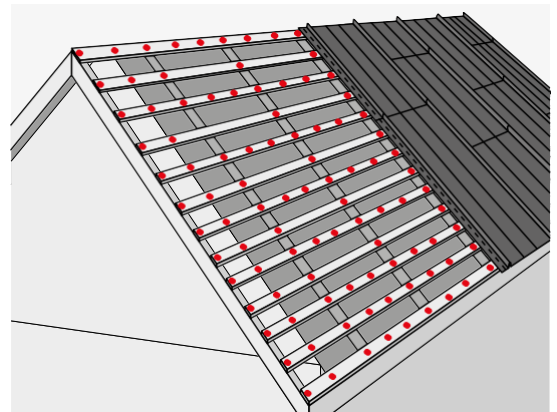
FASTENING THE PANELS TO THE ROOF PLANE
